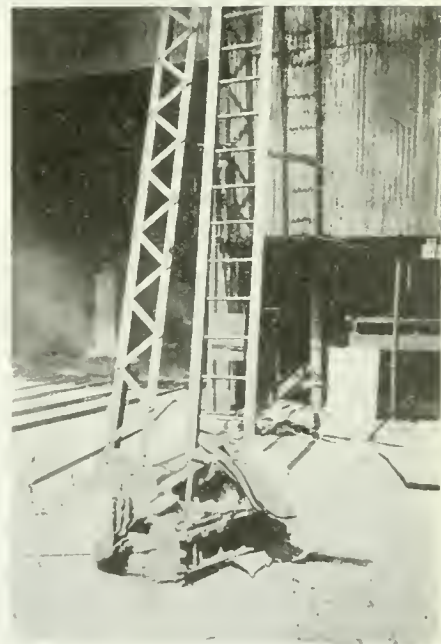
SCRAP PILED AT FOOT OF LADDER
